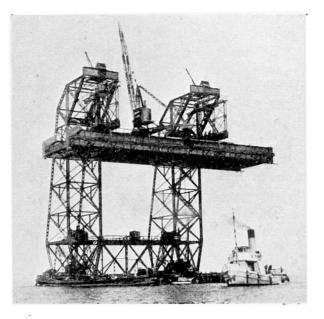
Storstrom Bridge. Floating crane lifting 500-ton side span complete with erection crane on it
